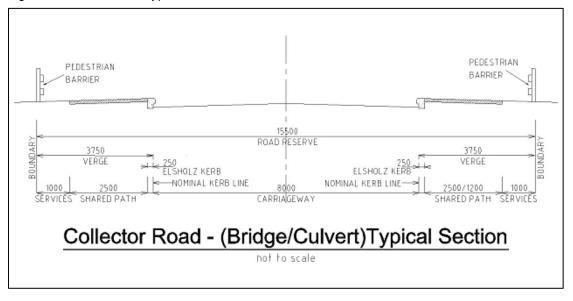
Manooka Valley Collector Road (Bridge/Culvert) Typical Section
